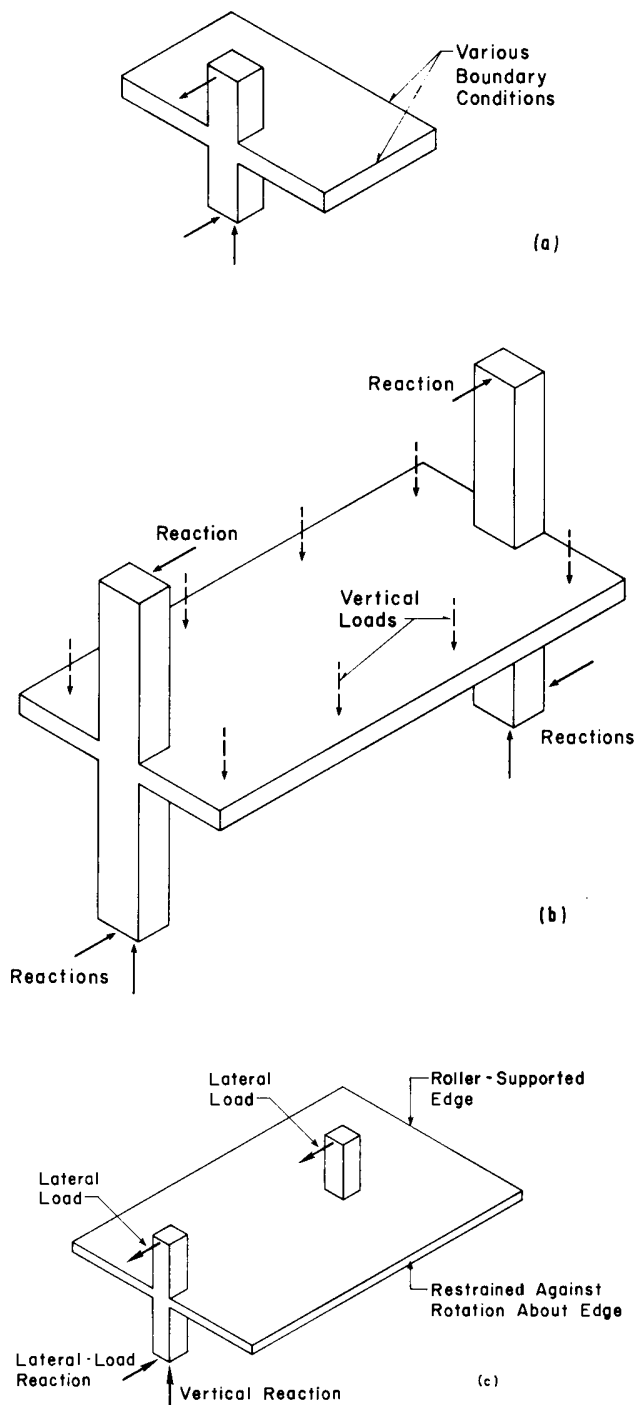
Test specimen configurations — (a) Isolated connection specimens; (b) Regan test specimens; and (c) Scavuzzo test specimens
